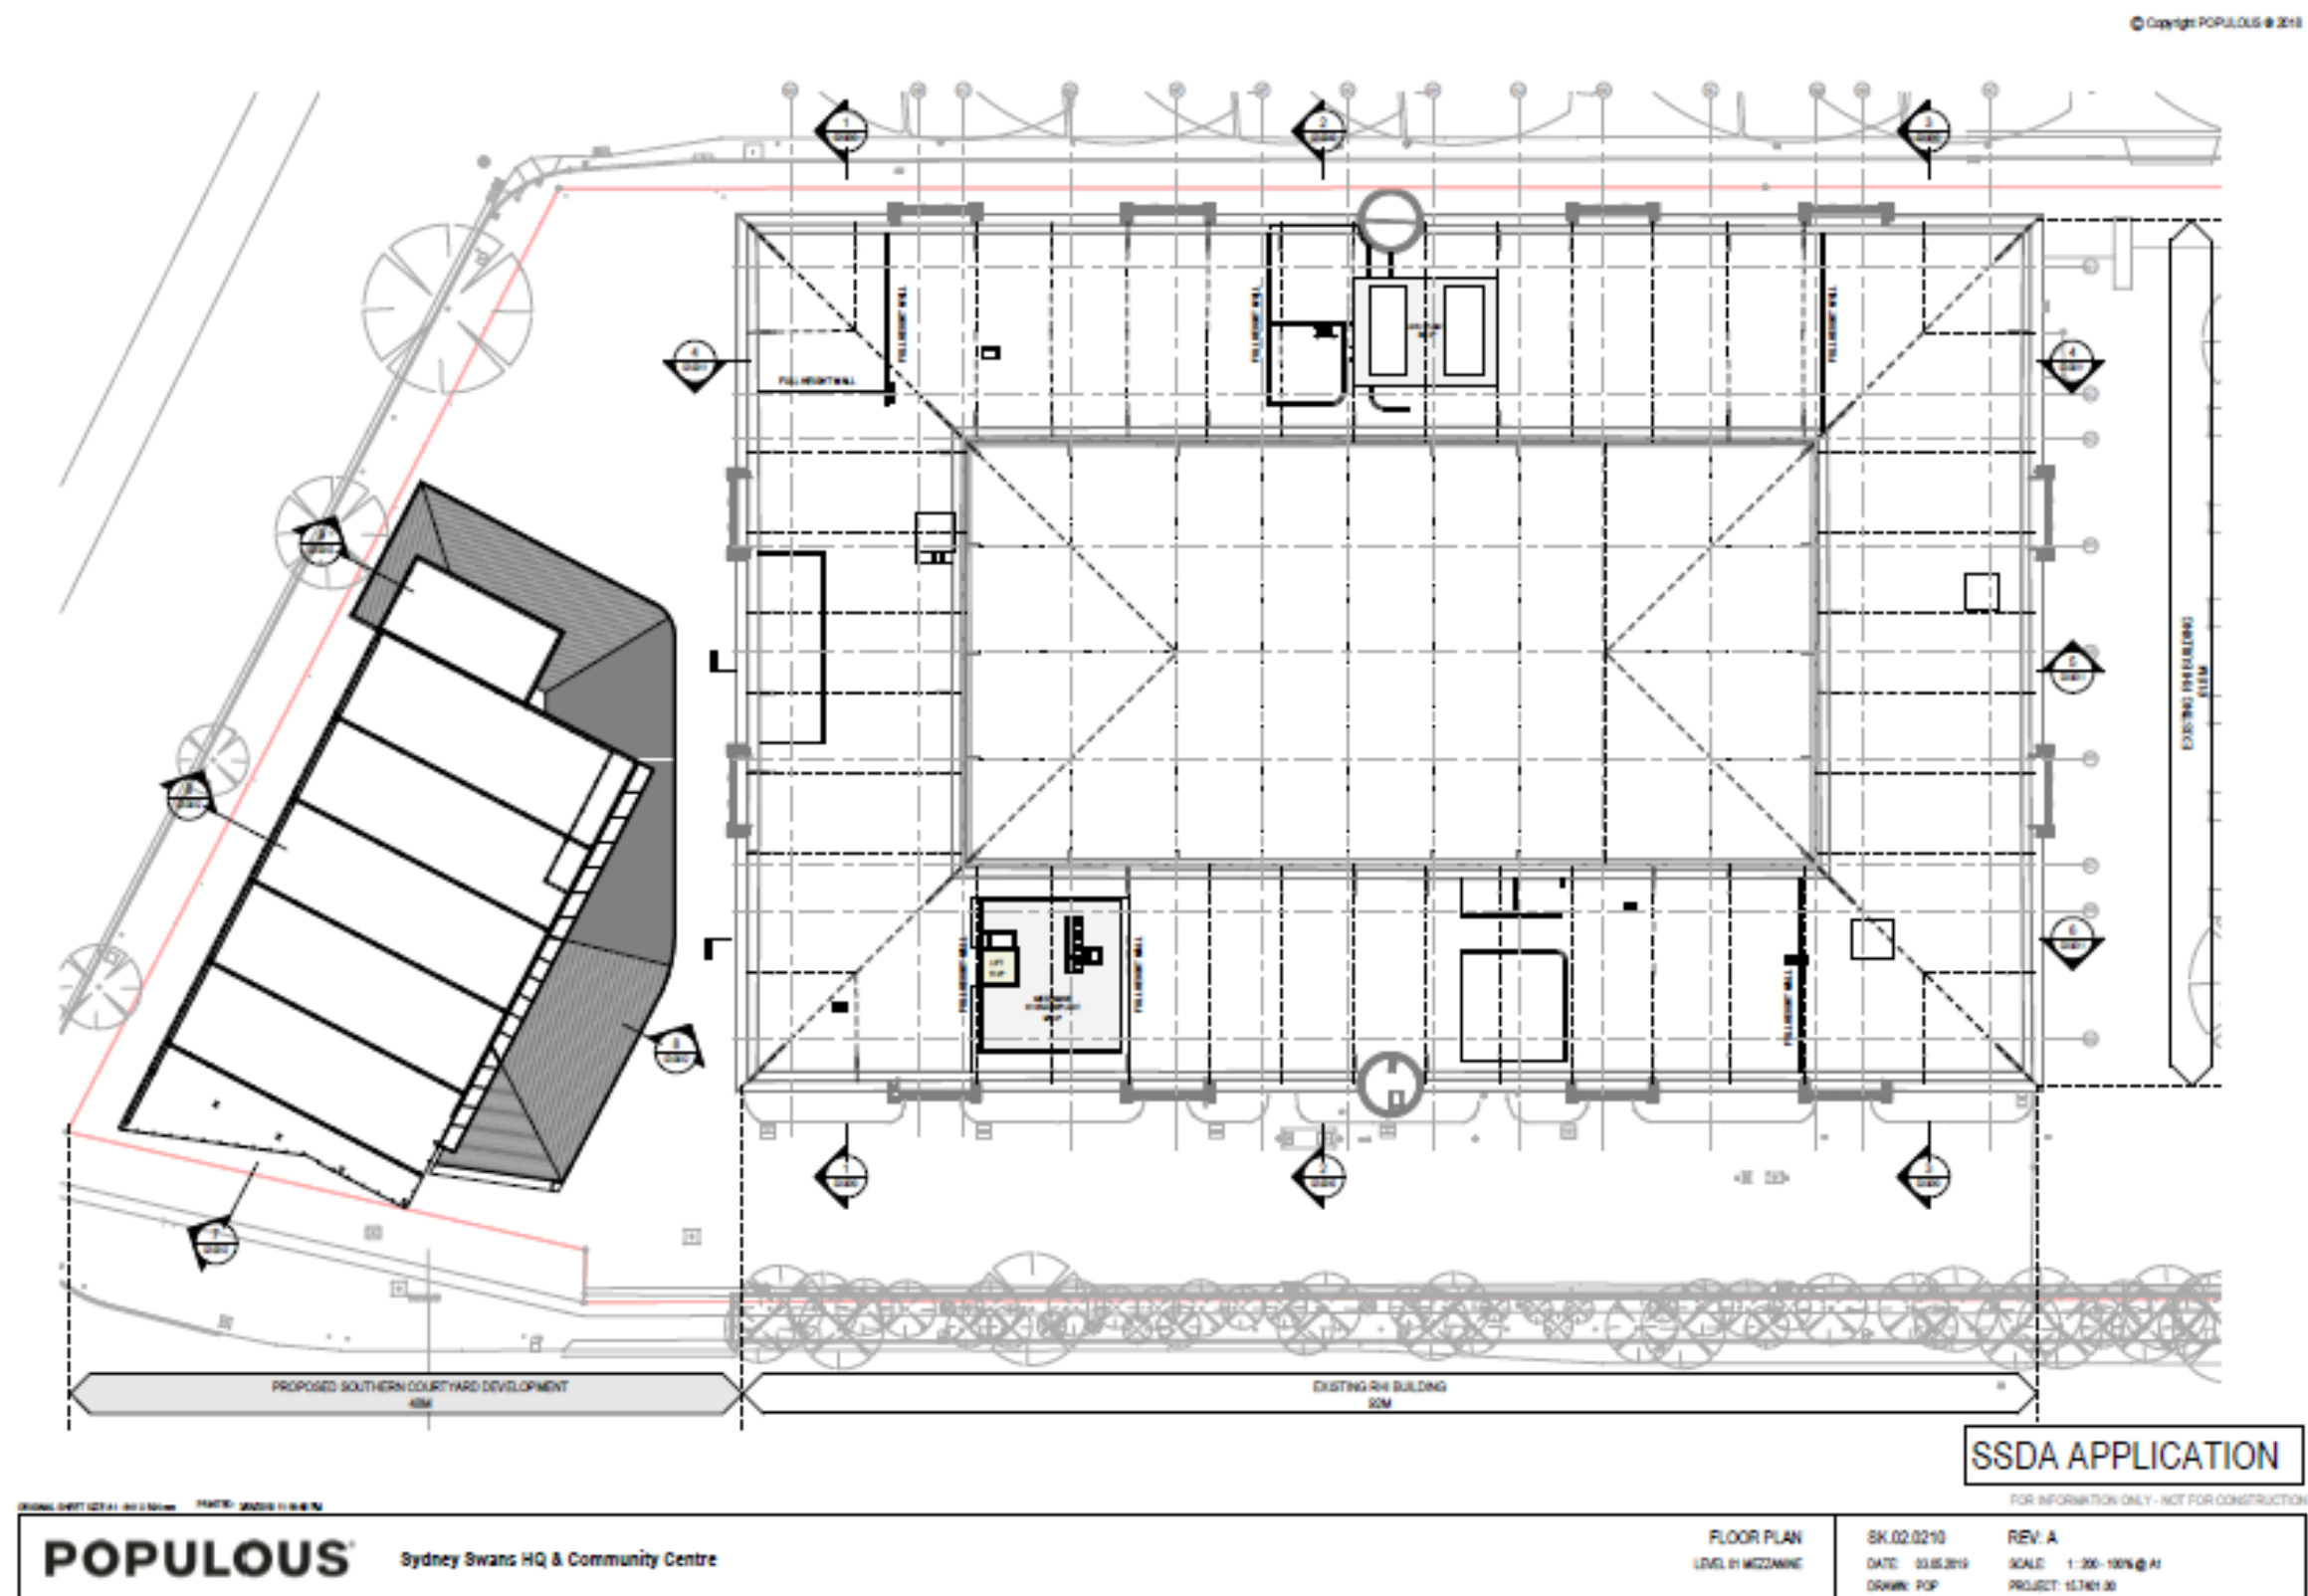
Proposed Floor Plan – Level 1 Mezzanine.
